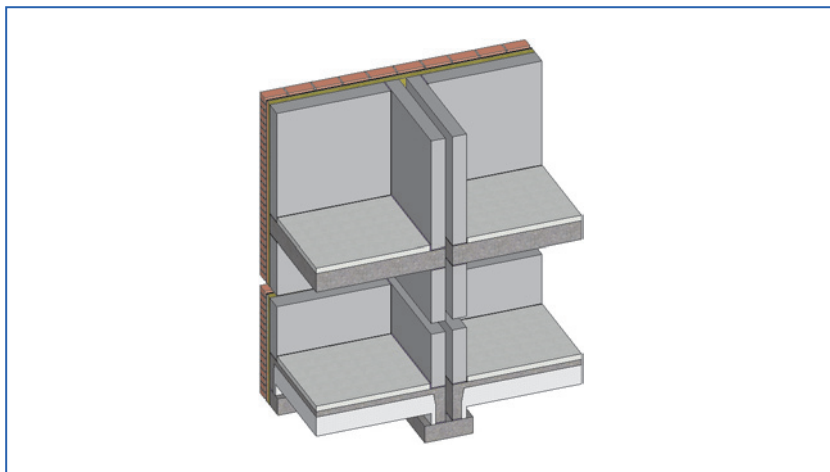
Ground floor and first floor details of a Dutch cavity wall in terraced houses. [[2] - (Netherlands)].
